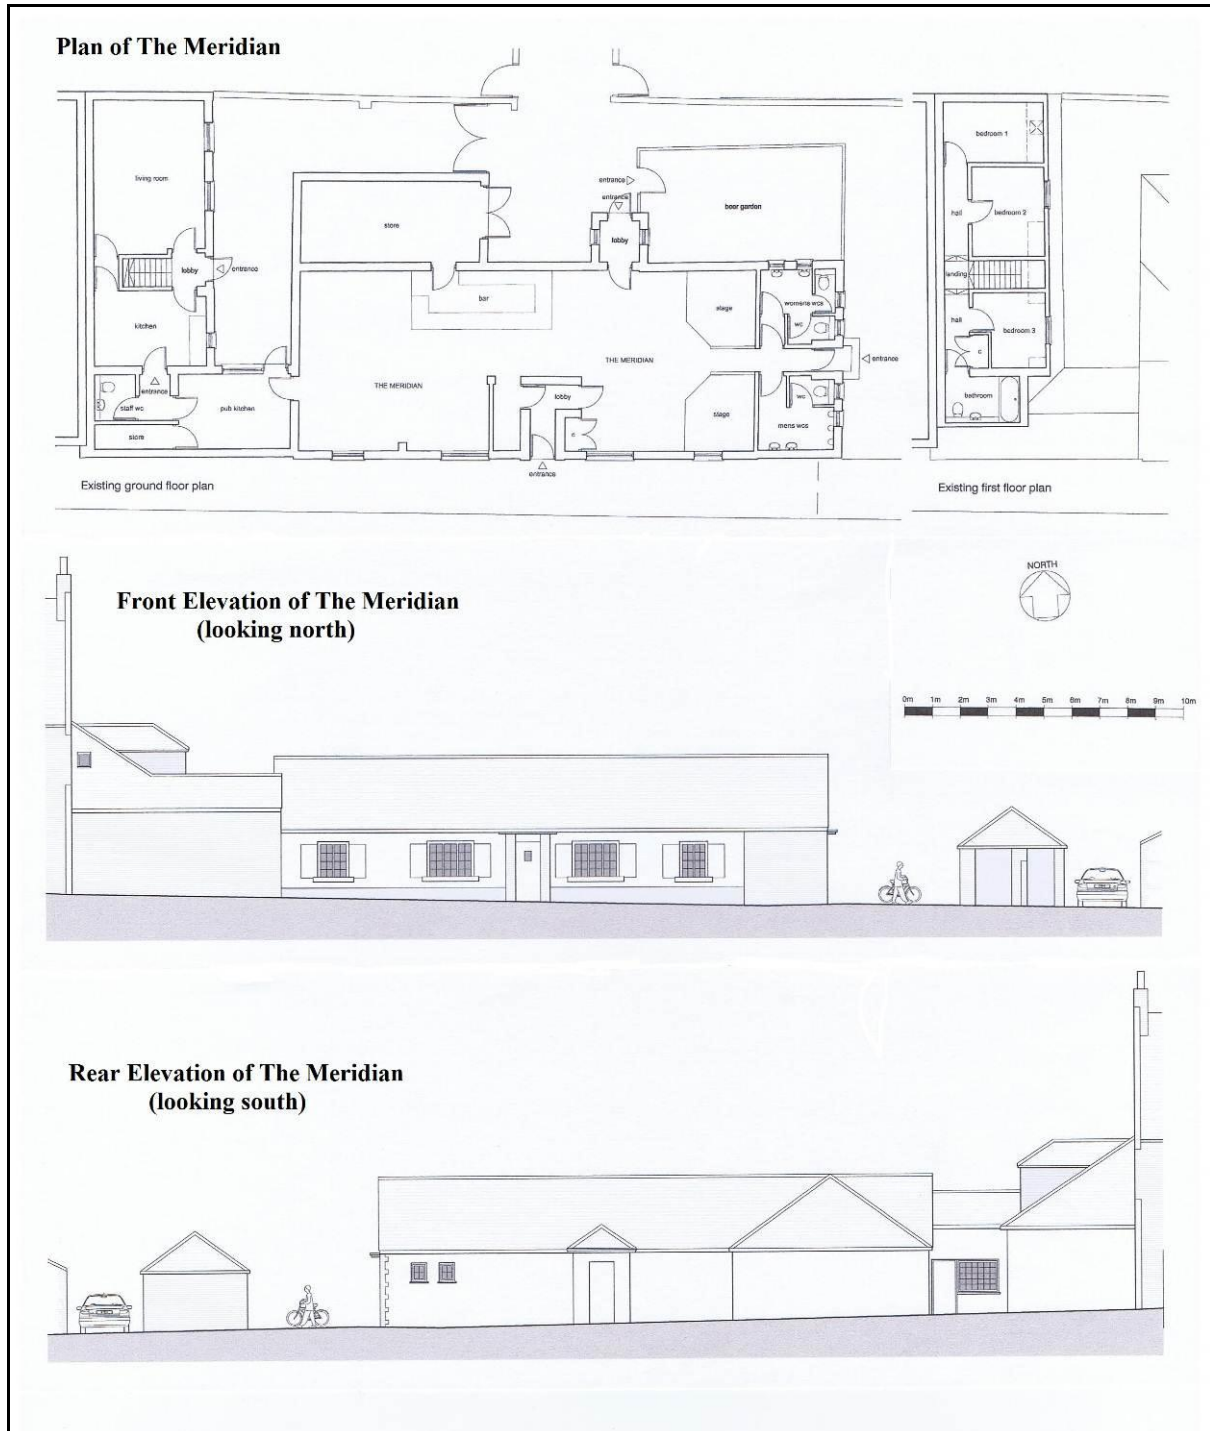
The Meridian, Lewes: Plan and Elevations of The Meridian (adapted from architects drawings)
